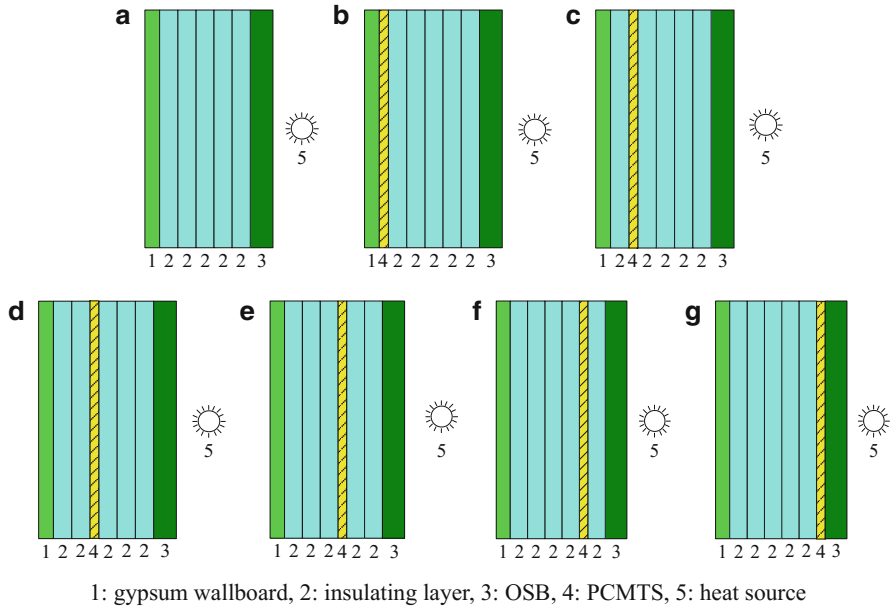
Schematic of wall construction (a) control wall, (b) PCM-enhanced wall with PCMTS at location 0/5 L, (c) PCM-enhanced wall with PCMTS at location 1/5 L, (d) PCM-enhanced wall with PCMTS at location 2/5 L (e) PCM-enhanced wall with PCMTS at location 3/5 L, (f) PCM-enhanced wall with PCMTS at location 4/5 L, (g) PCM-enhanced wall with PCMTS at location 5/5 L. 1: gypsum wallboard, 2: insulating layer, 3: OSB, 4: PCMTS, 5: heat source
